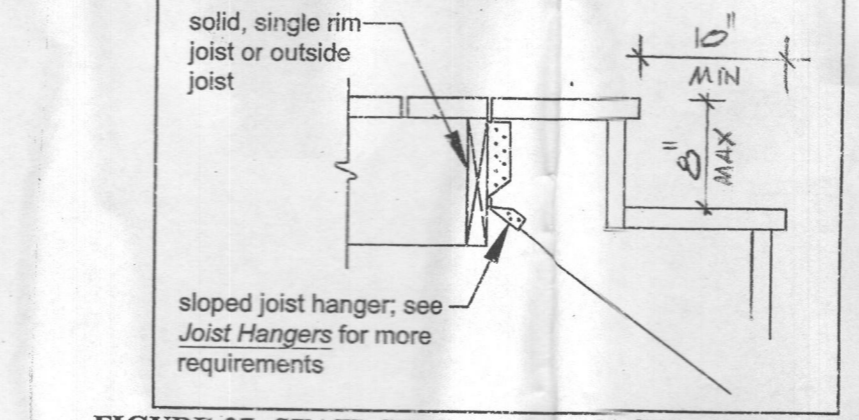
STAIR STRINGER ATTACHMENT DETAIL
